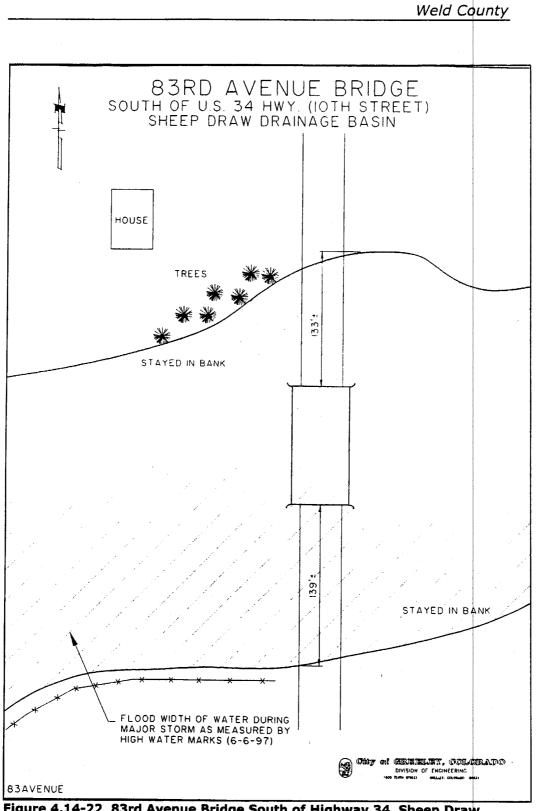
83rd Avenue Bridge South of Highway 34, Sheep Draw Drainage Basin
